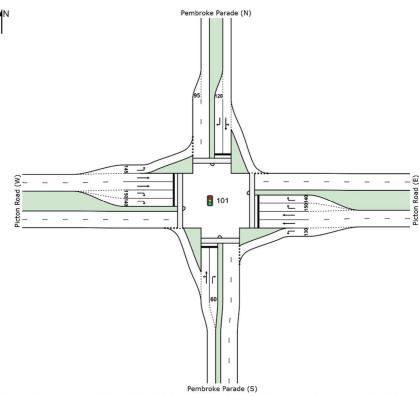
Picton Road / Pembroke Parade intersection conceptual layout
